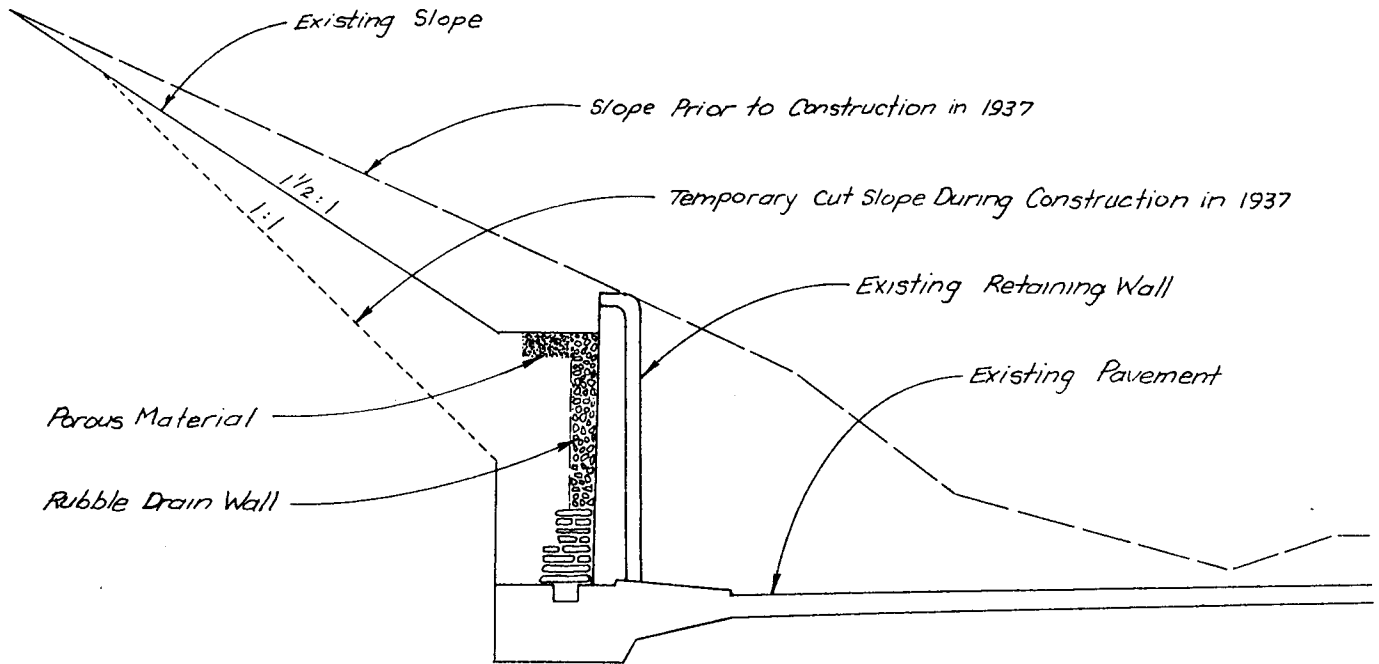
Typical pre- and post-construction (1937) topography along the Columbia Parkway retaining wall.
